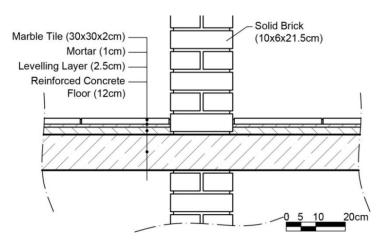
First Floor Interior Wall I: Between Office Rooms and Atrium
